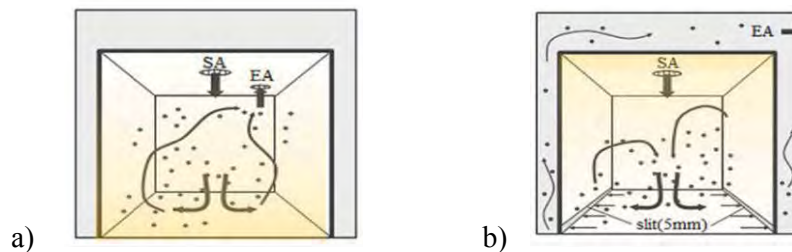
Two ventilation system. a) ceiling exhaust, b) slit exhaust
